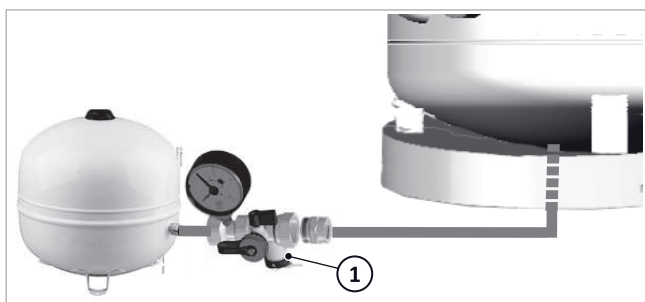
Boiler filling and emptying valve on the MEV connection group
